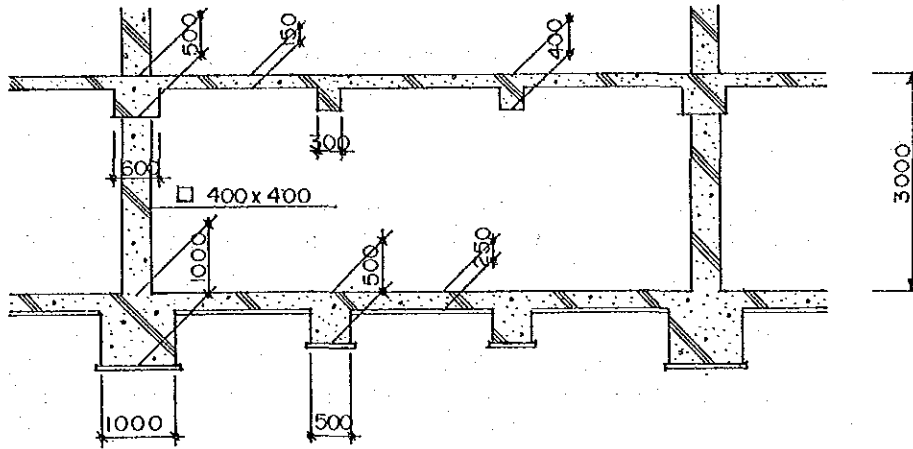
CROSS SECTION OF PARKING BUILDING
